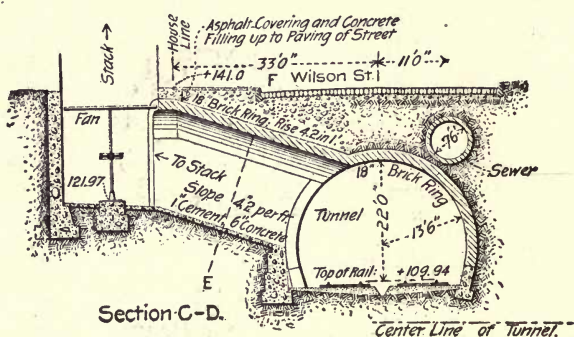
Baltimore & Potomac Tunnel: Section of Conduit Leading to Fan-chamber.
